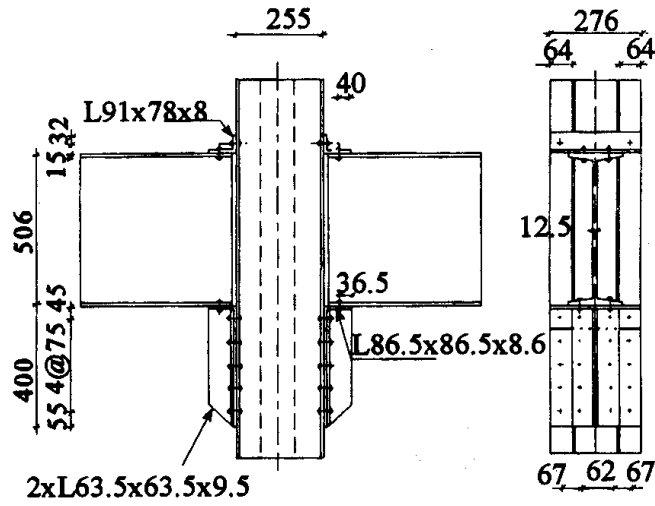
Detail of riveted stiffened seat angle connections - built-up steel column detail without concrete encasement.
